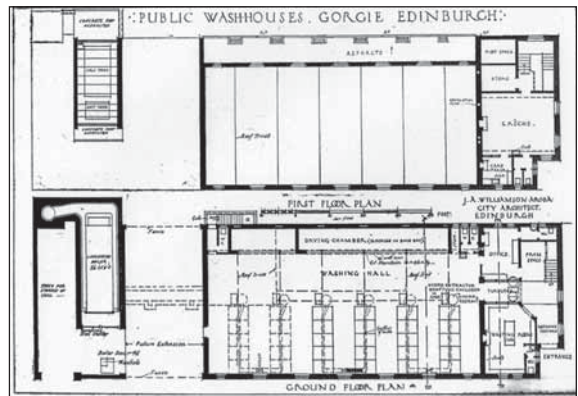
Plan of McLeod Street Public Washhouse, Gorgie. (*Building News*, February 21 1917.)
